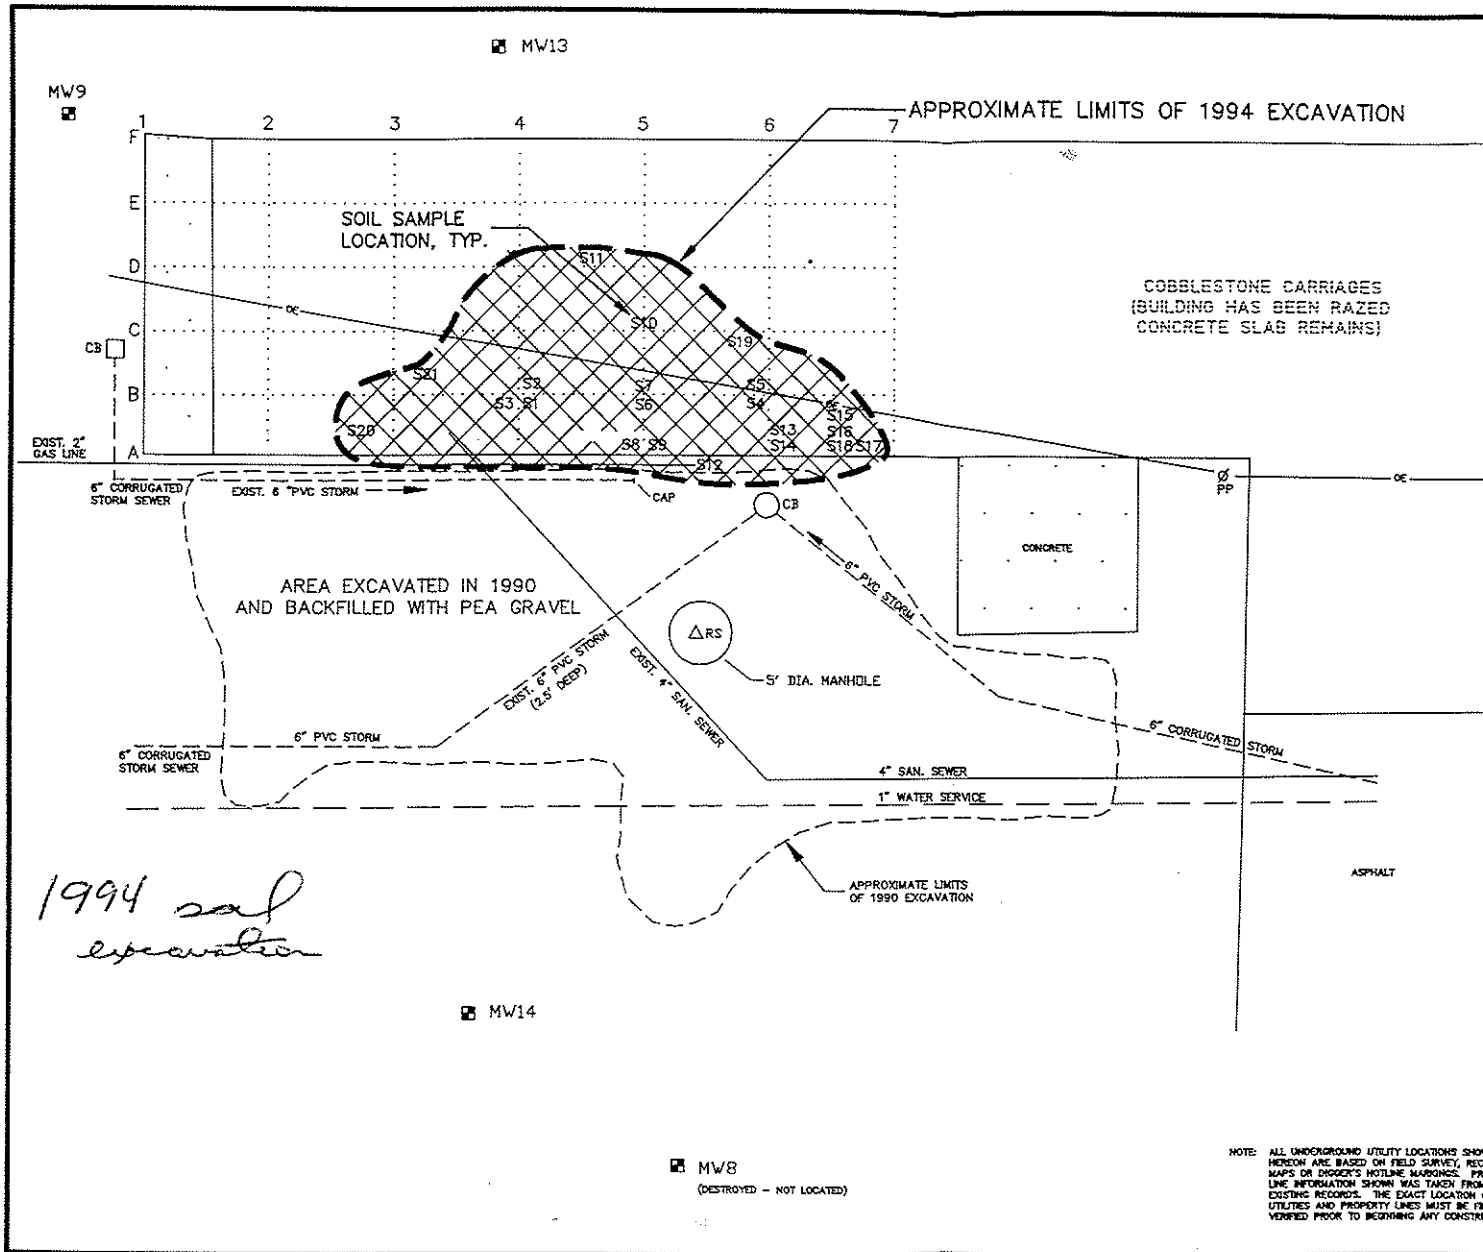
SOIL EXCAVATION AND UNDERGROUND REMEDIATION PIPING PLAN
